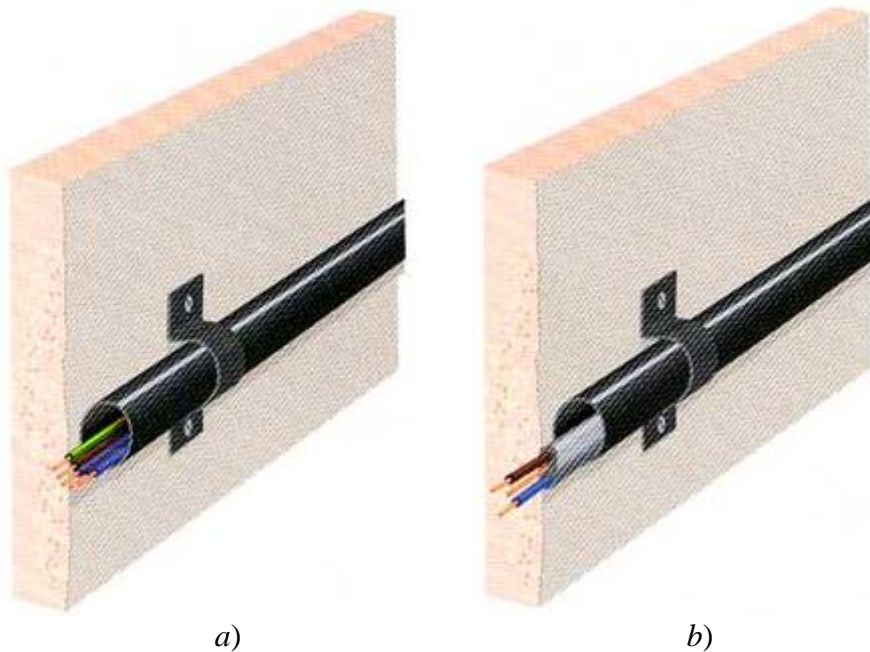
Insulated conductors without sheath (*a*) and with sheath (*b*) in conduit on a wooden, or masonry wall
